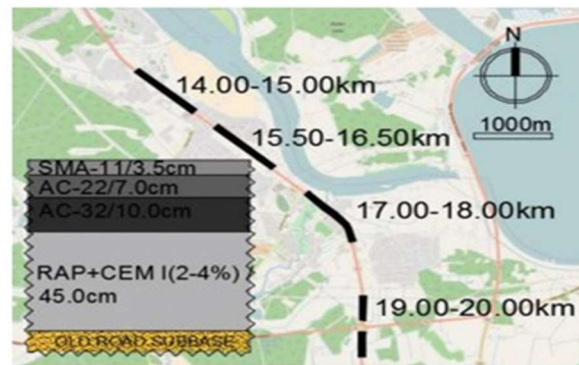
Location of research sections along the road A7 Riga—Bauska—Lithuanian border and designed pavement structure. (After Skels et al.2017)
